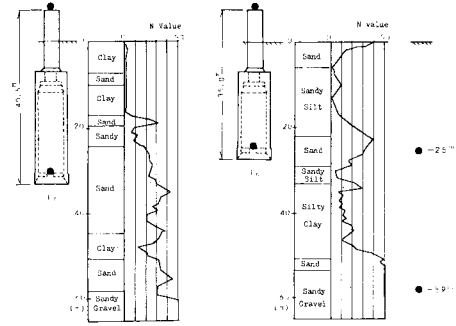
Caisson-Pier (P_2 , P_5) and Soil Profile.
